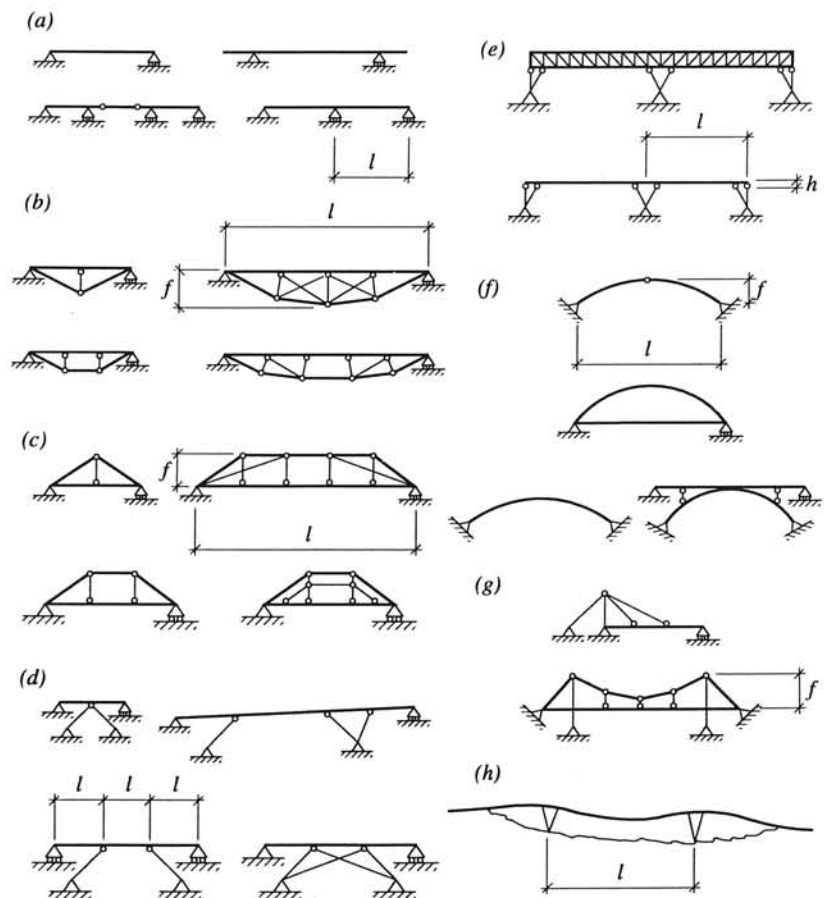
Structural forms of bridges. (a) Beams on two or more supports, (b) trussed systems, (c) kings and queens post trusses, (d) strut frame systems, (e) frame systems, (f) arch bridges, (g) suspended and cable-stayed systems, (h) chainlike structure.
